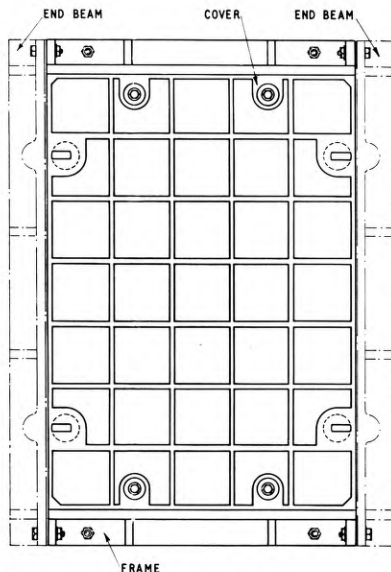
PLAN OF NEW COVER SHOWING END BEAMS
